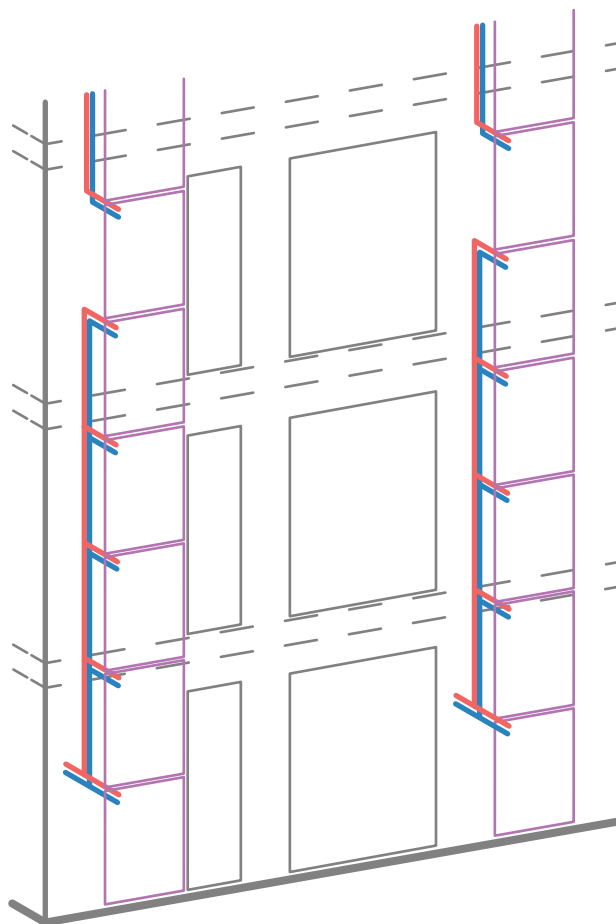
Proposed indoor piping system for vertically arranged facade-integrated PVT collectors (own illustration).
